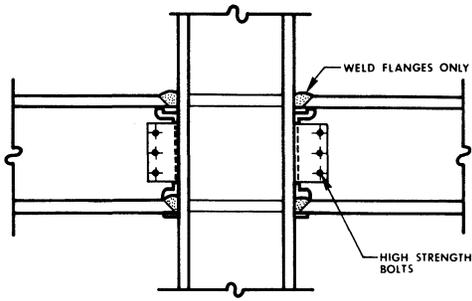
Moment connection using shear connection plate. High strength bolted web connection allows flange weld shrinkage strains to be relieved.
